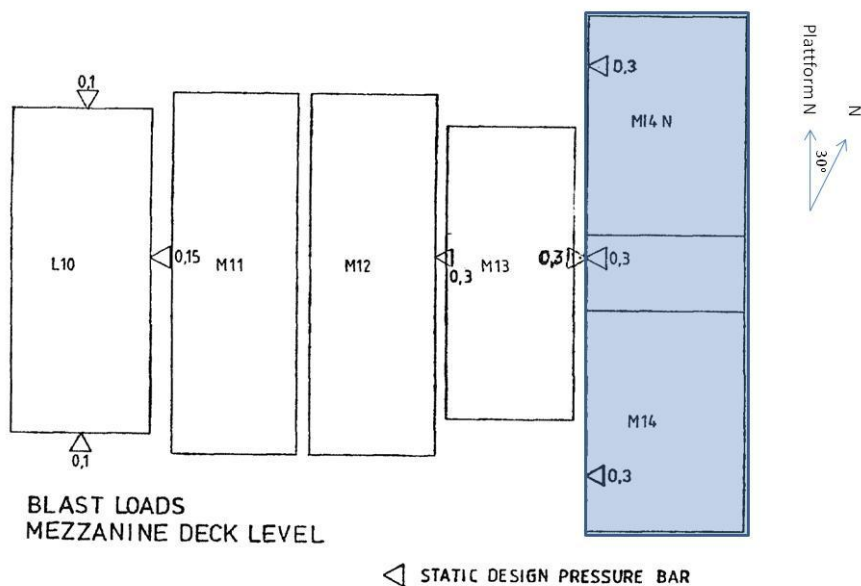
Static blast load which the wall between M14 and M14 is designed to withstand
